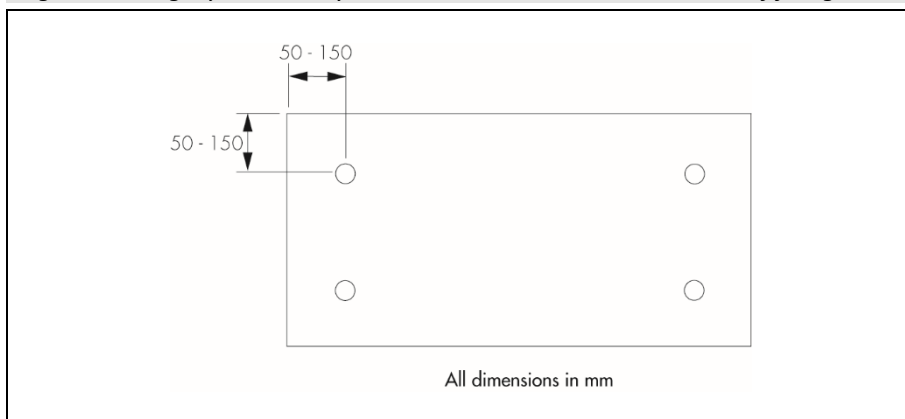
Fixing layout 1200 by 1200 mm board — minimum number of fixings
